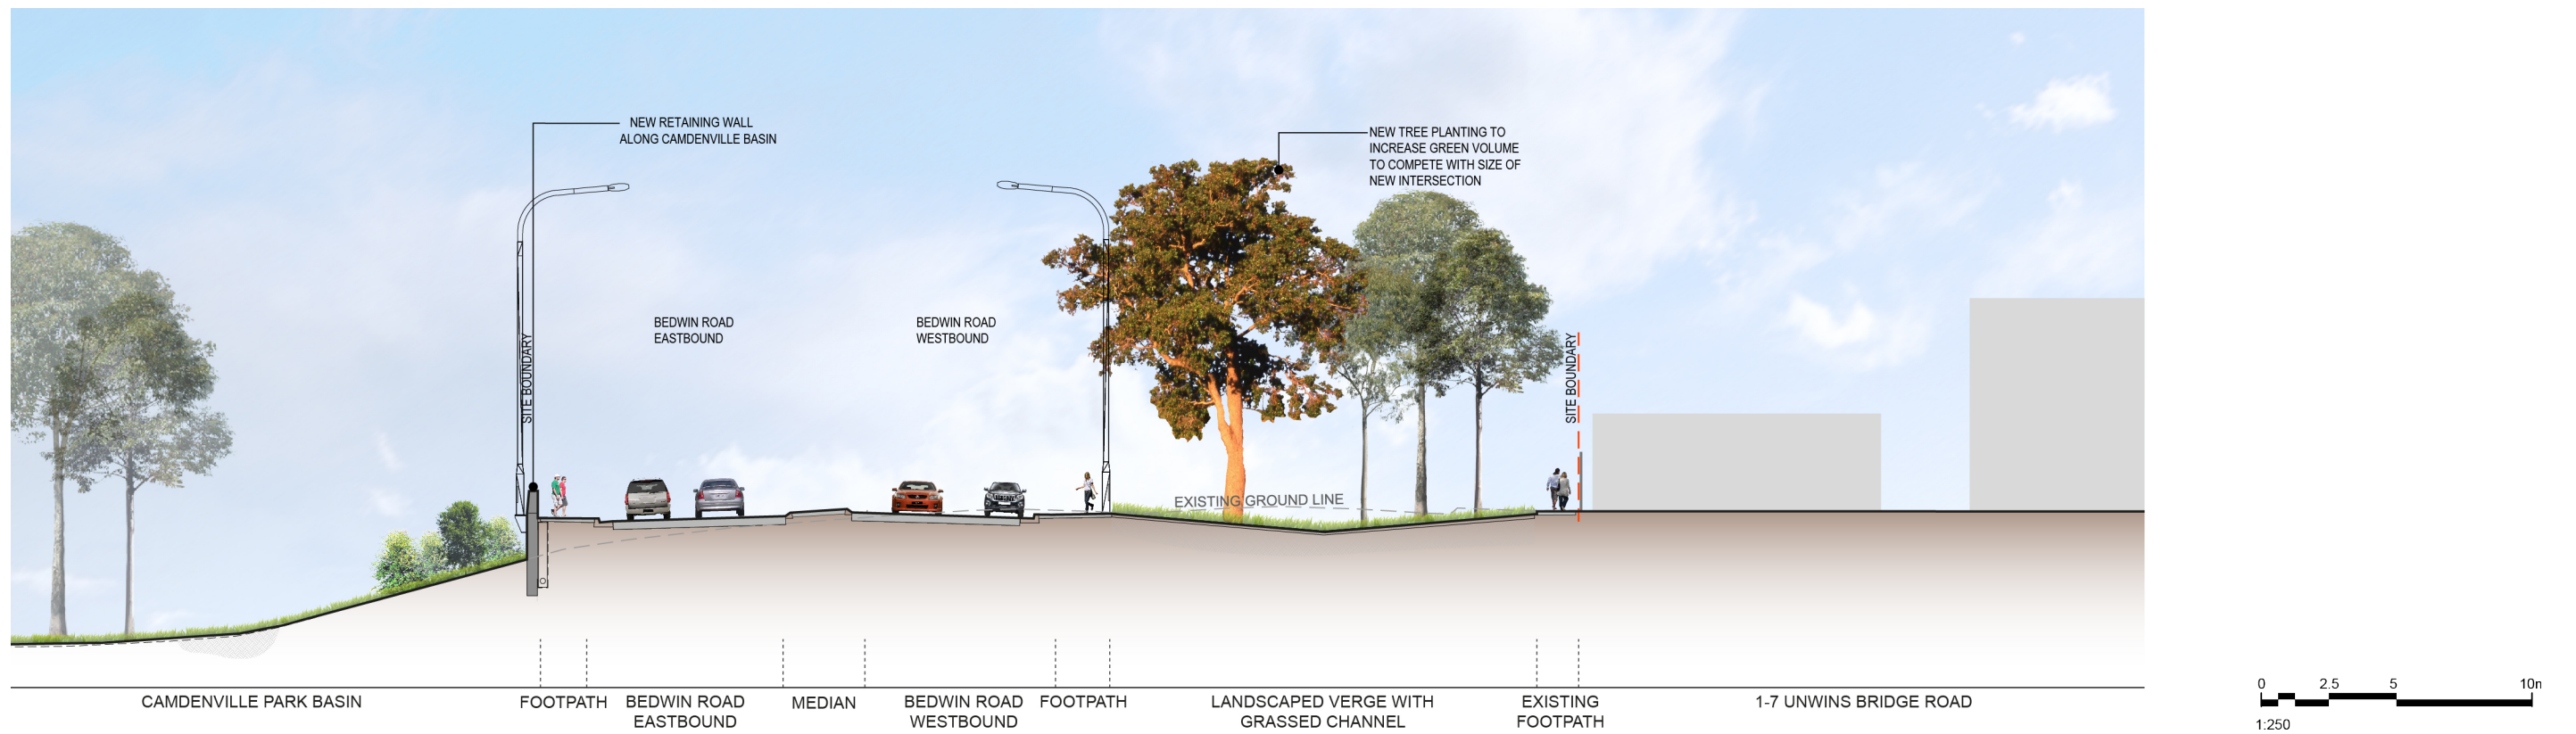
Typical Cross Section - Camdenville Park and Bedwin Road - 1:250
